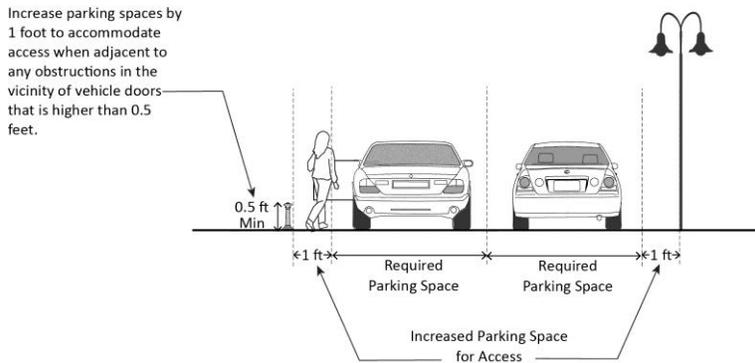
(D.3): PARKING SPACES ABUTTING A WALL, FENCE, OR COLUMN
